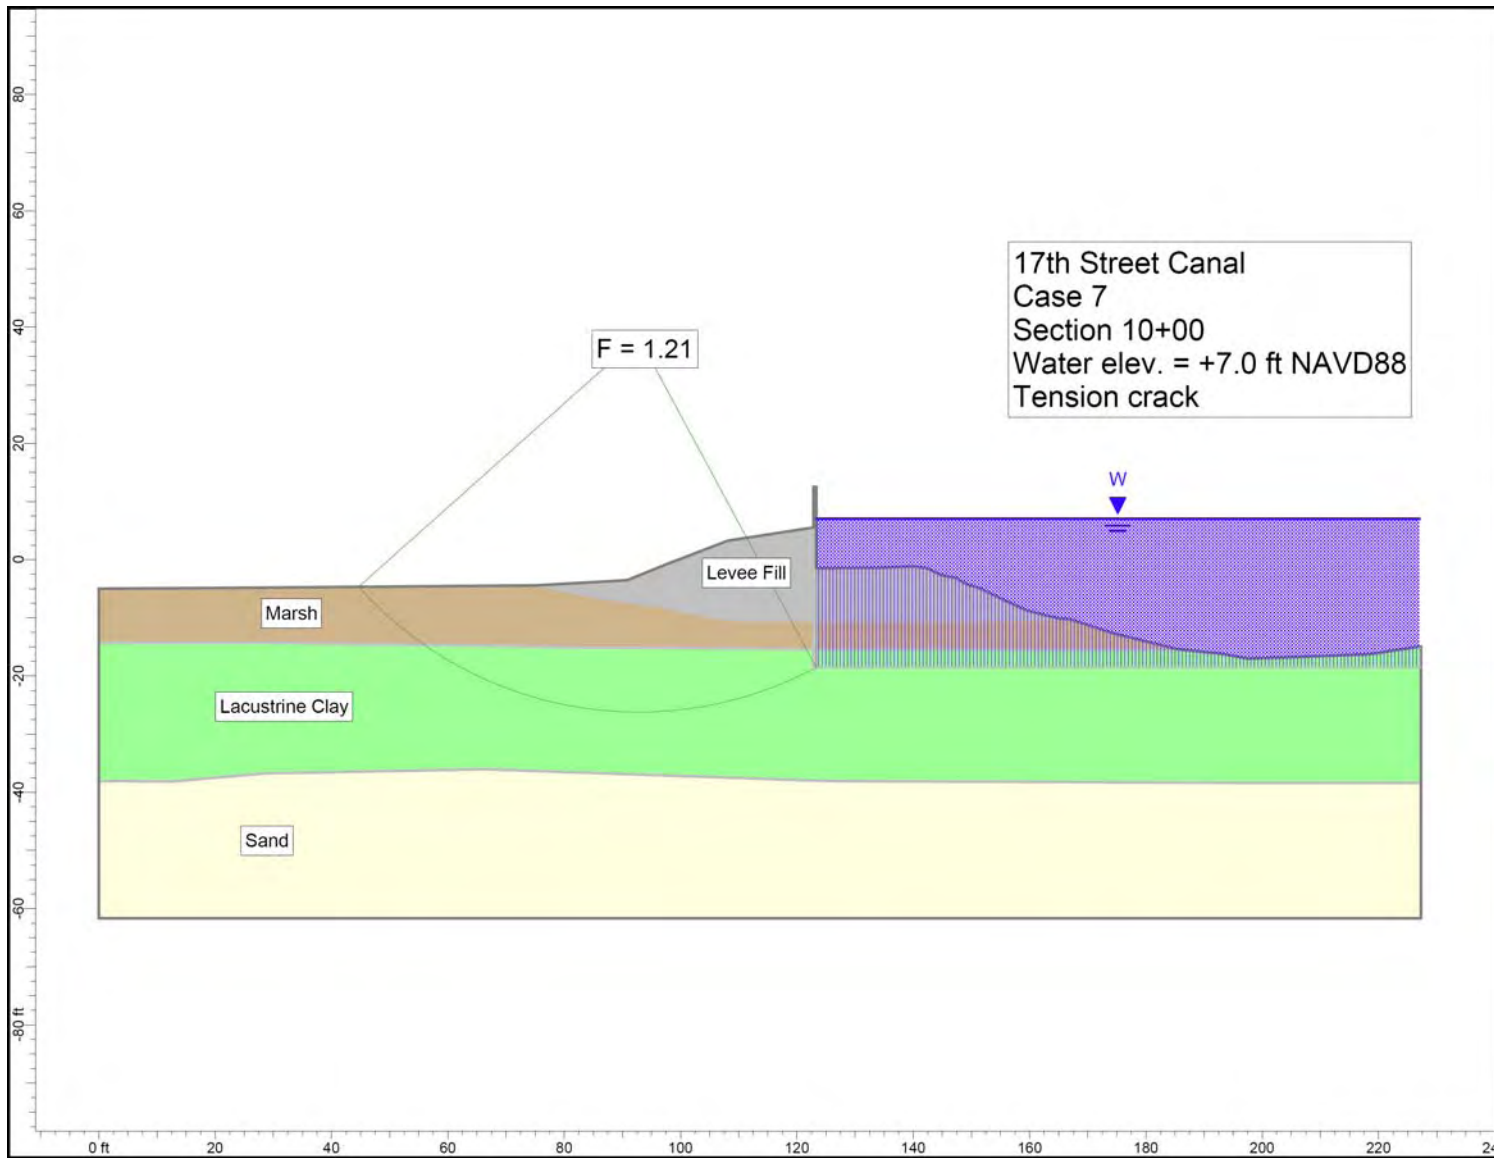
Critical Circle for 17th Street Canal Station 10+00 – Water Elevation 7.0 ft, Tension Crack
